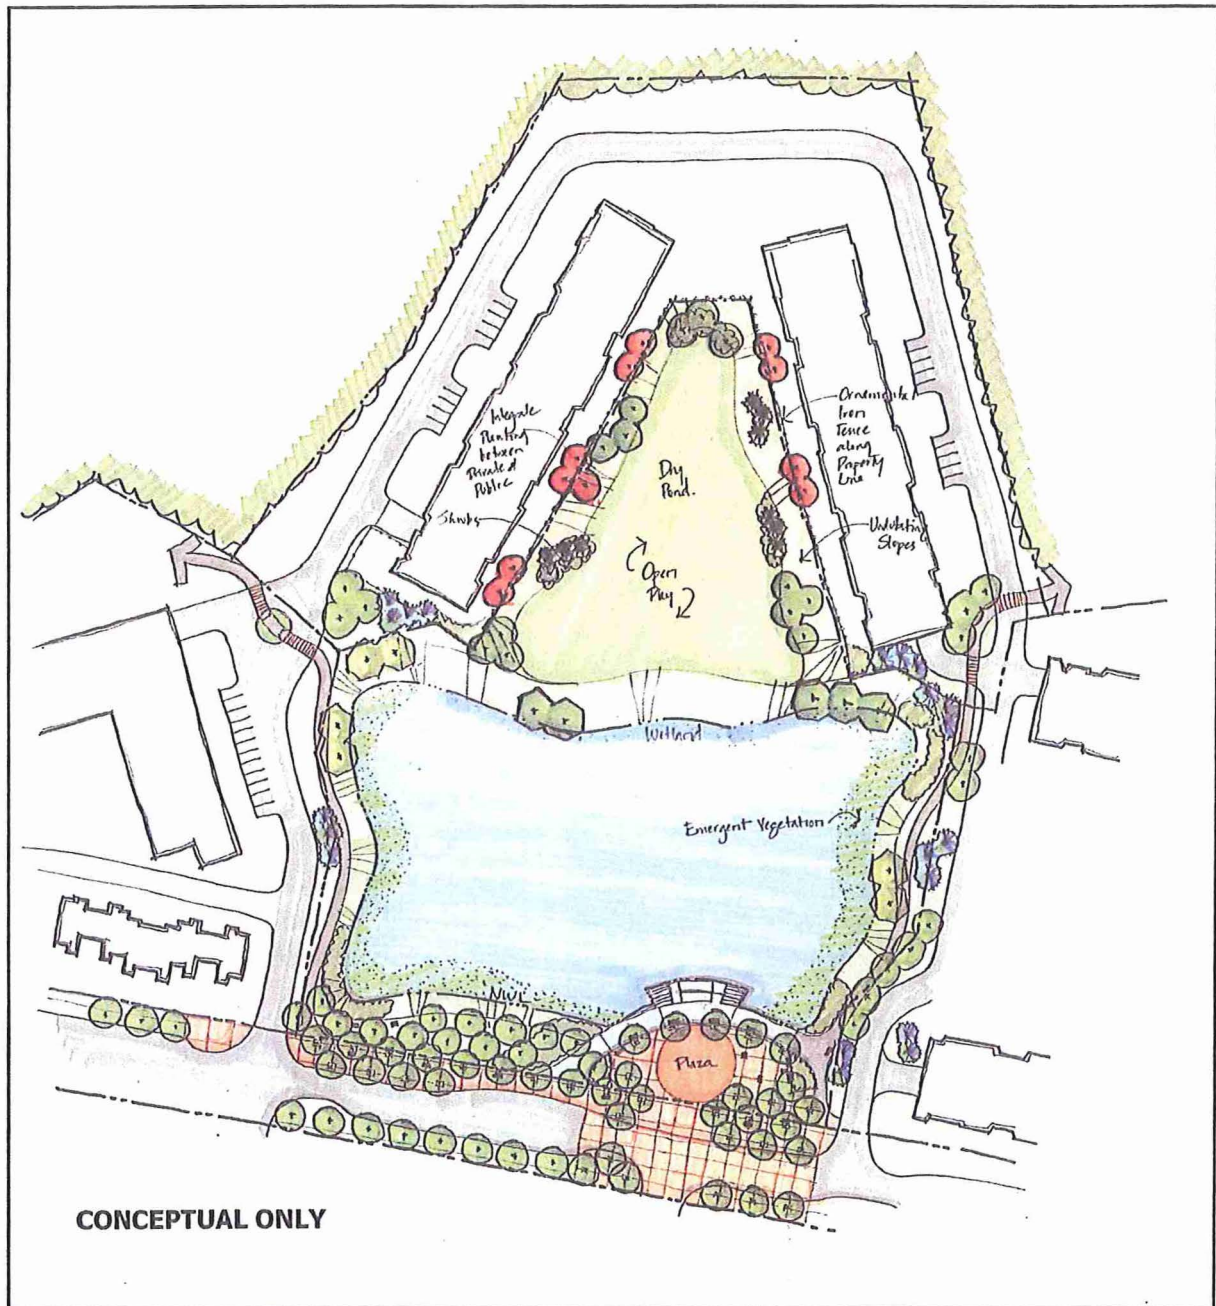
CONSTRUCTED WETLAND CONCEPT PLAN
